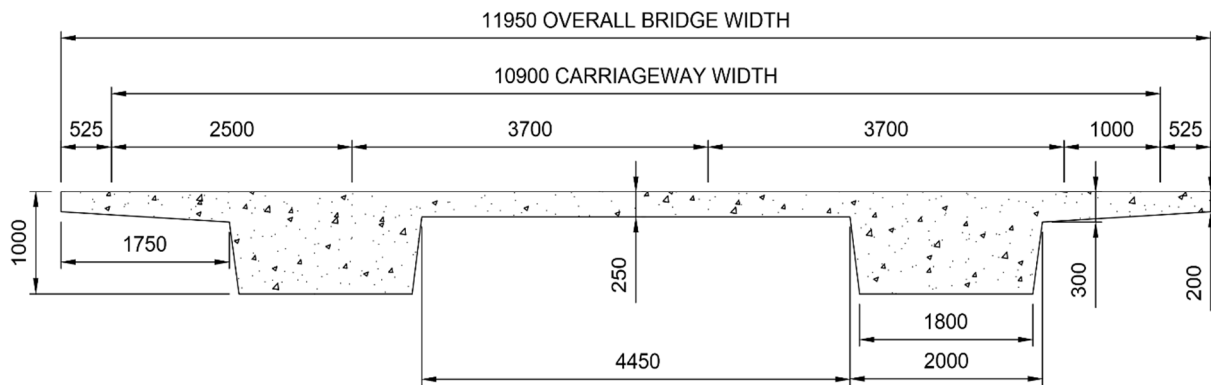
Cross-section of bridge deck with traffic lane arrangement (units in mm) of KPCS (Basson, 2020)
